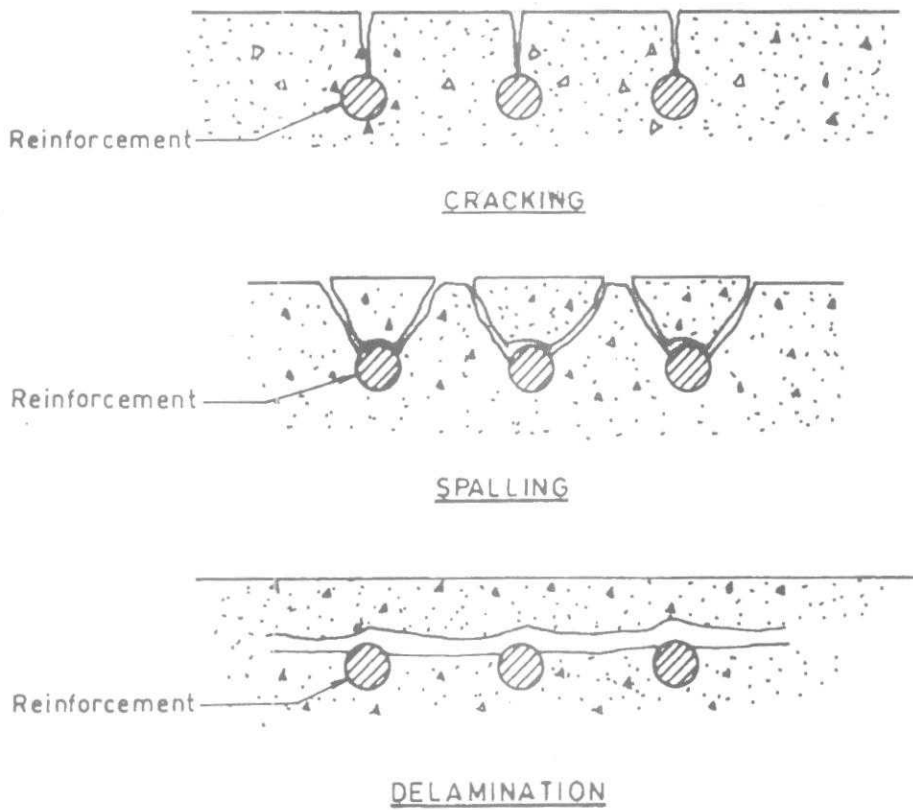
DAMAGE INDUCED CORROSION, CRACKING, SPALLING AND DELAMINATION
